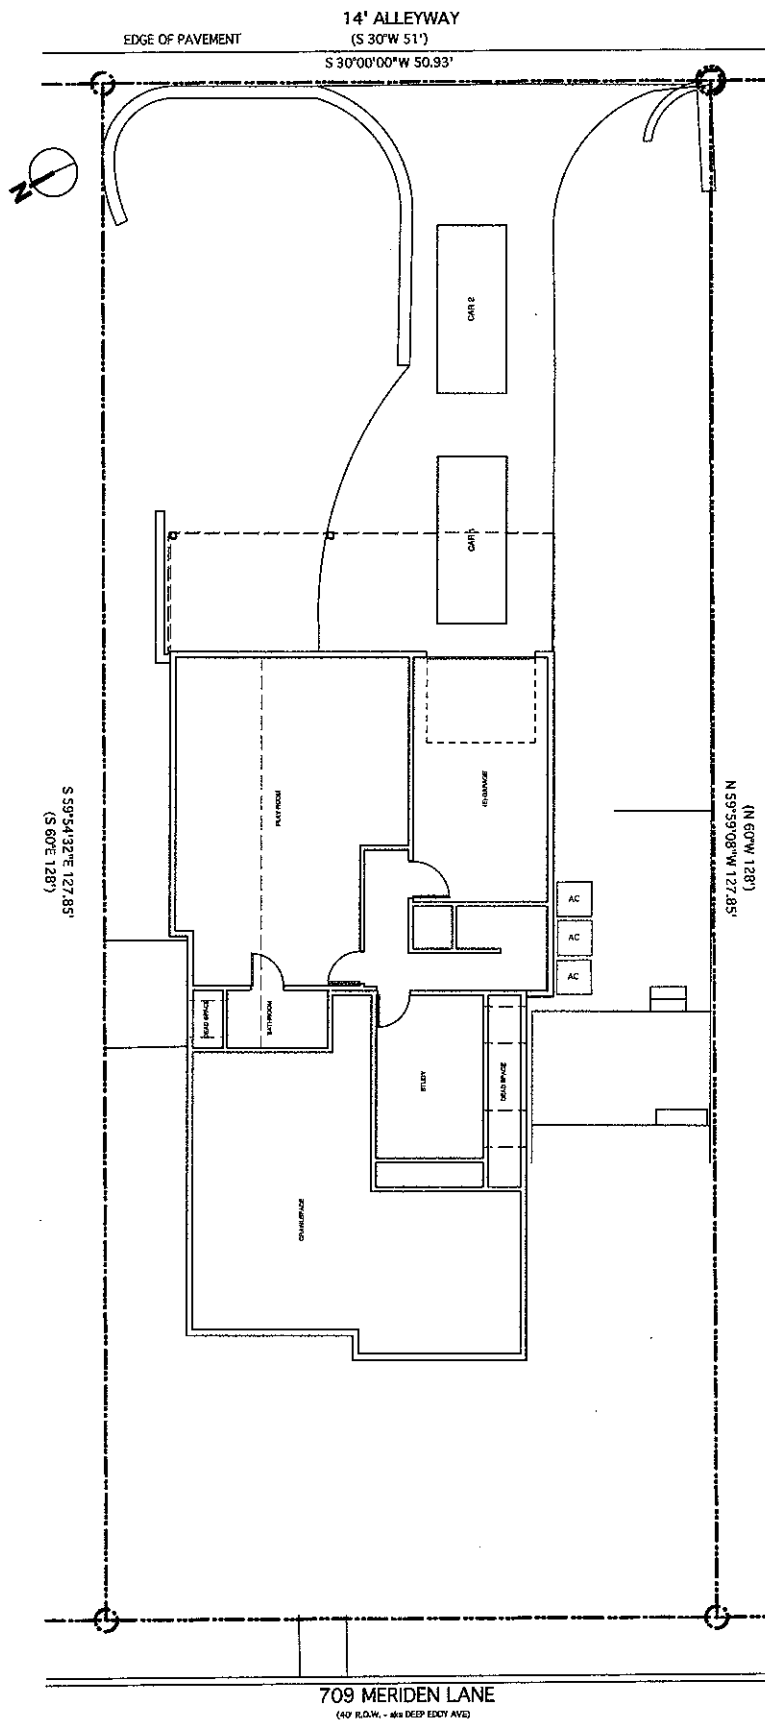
Existing basement-level plan showing driveway parking spaces.
